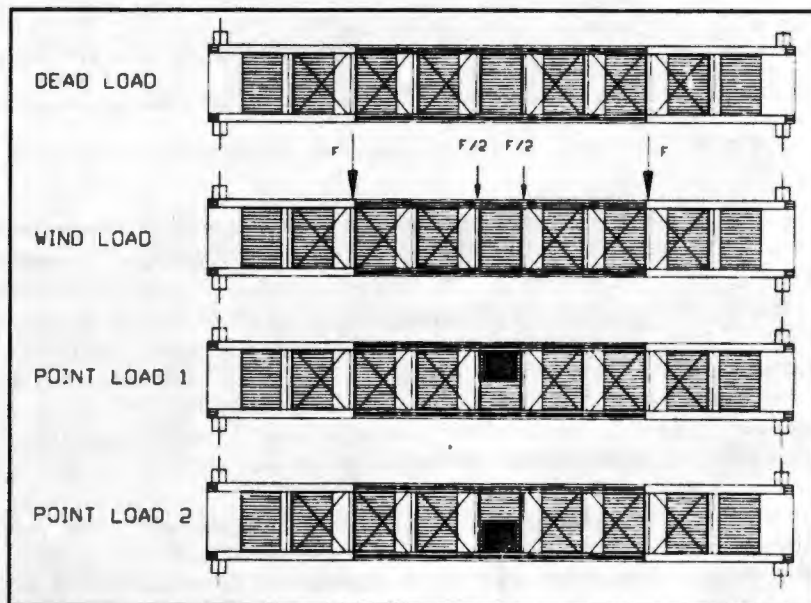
Load arrangements for dead load, wind load and concentrated loads at the centre of the span.
